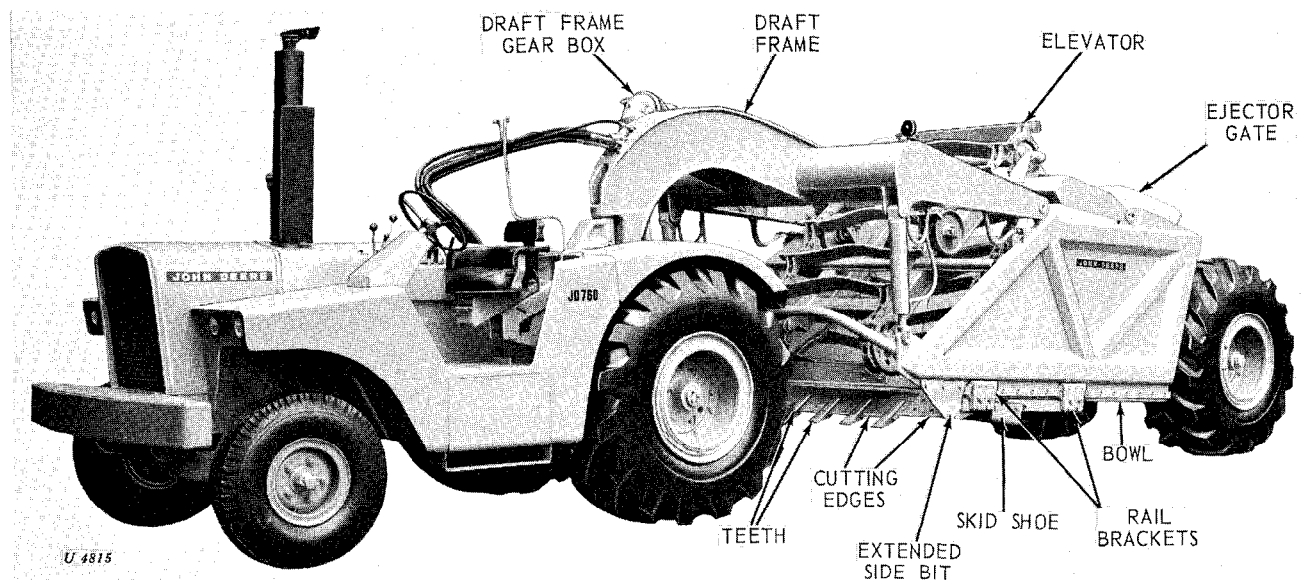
John Deere JD760 Elevating Scraper
